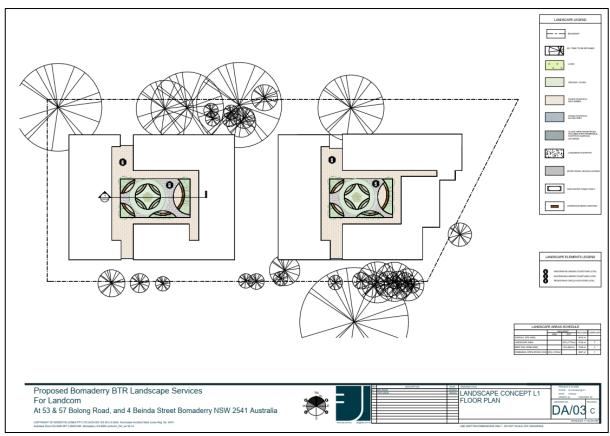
Proposed landscape concept – L1 Floor Plan. (Source: Edmiston Jones)
